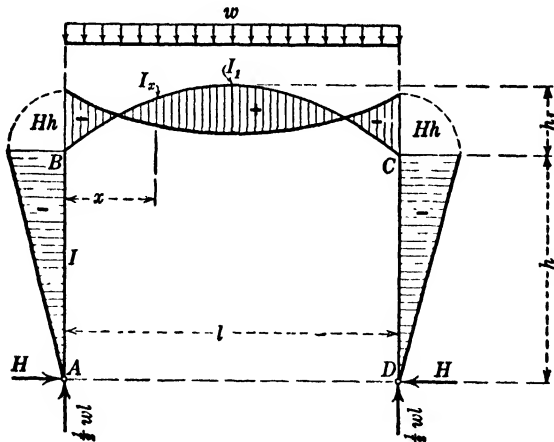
Parabolic Roof Frame, Uniformly Distributed Load. (See p. 308.)
